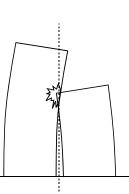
(b): Pounding due to Small Gap of Two Buildings
